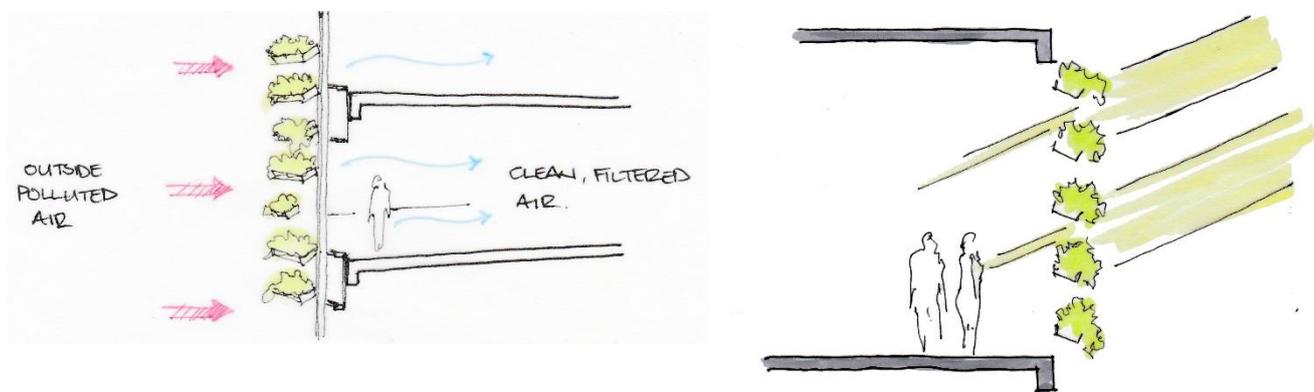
(Above Left) & Figure 88 (Above Right): Sketches indicating how a permeable green wall can filter air and sunlight (Source: Author).
